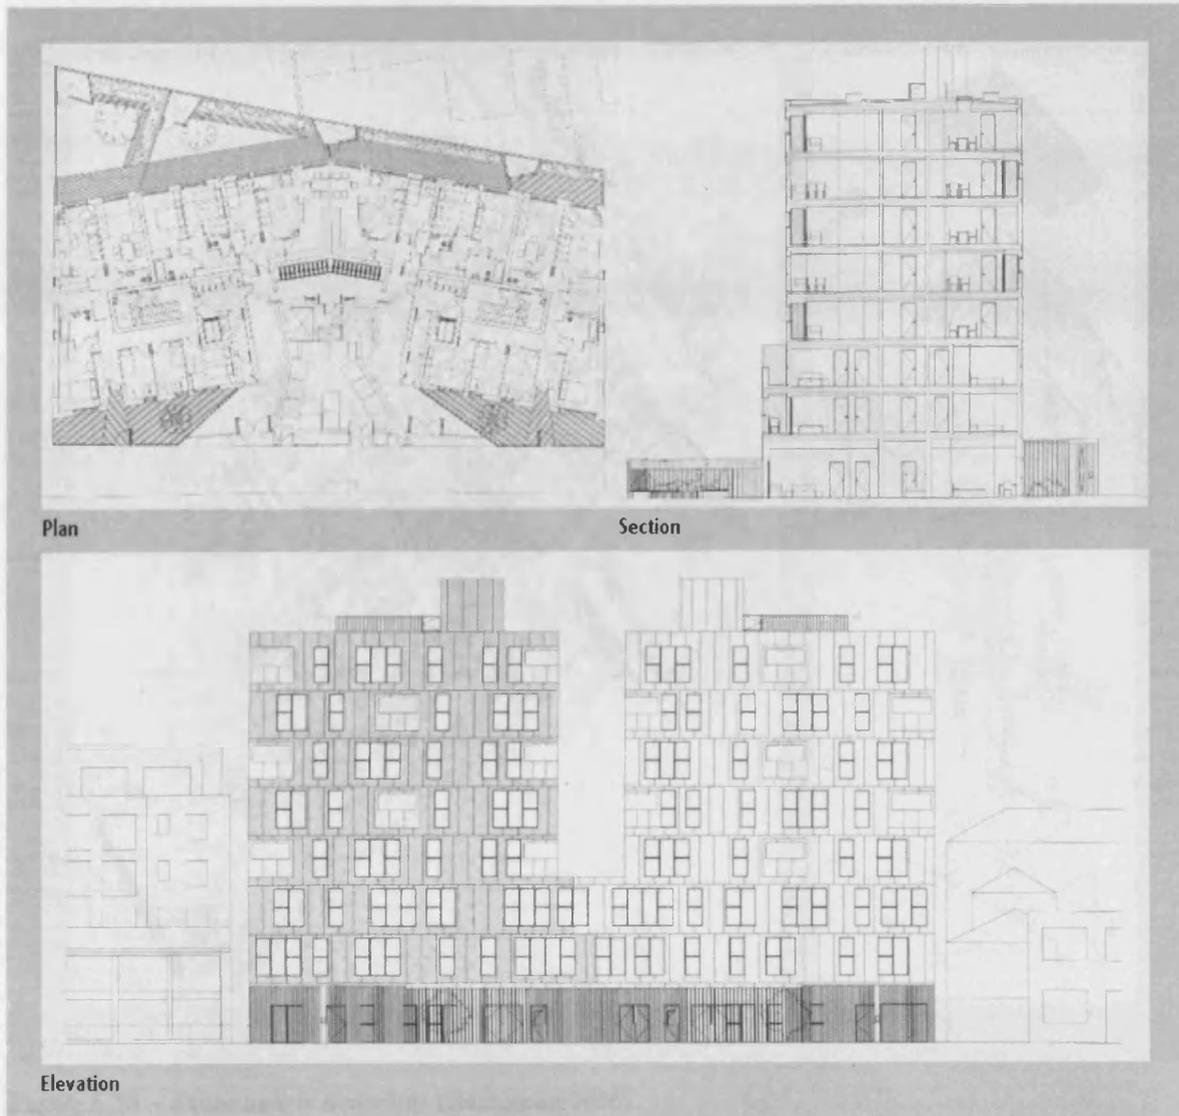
Plans, elevations and sections (Adjaye 2006)
